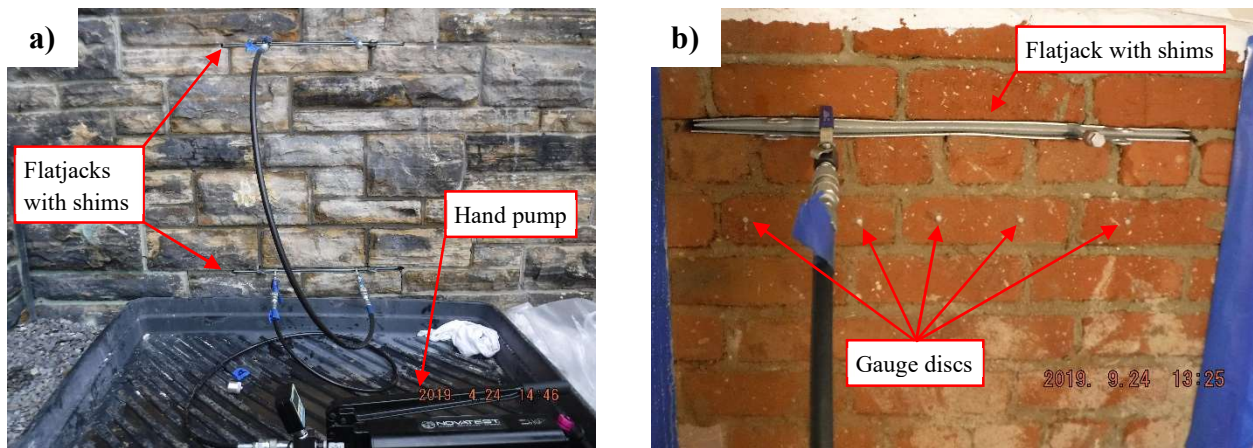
Typical Test Set-up for ASTM C1197 in a) Nepean sandstone masonry, and b) Clay brick masonry
